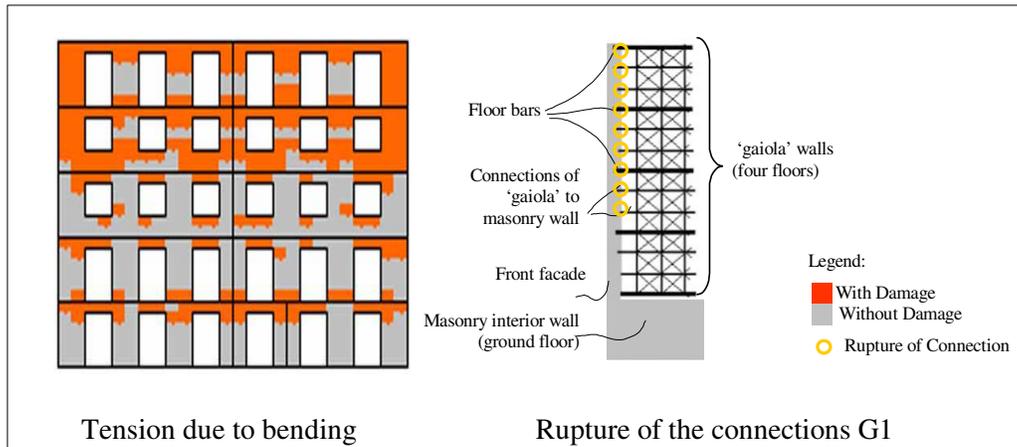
Masonry damages and the rupture of connections at the end of the iterative process that allowed identifying the bending of the front façade collapse mechanism
